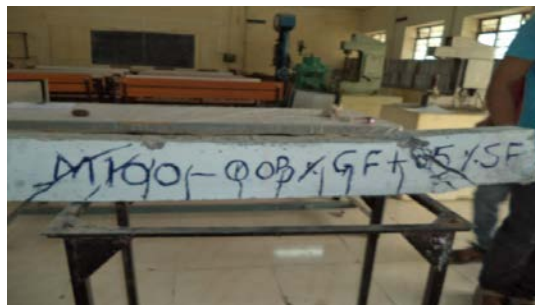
Failure modes of Hybrid fibre High Strength Reinforced Concrete Self Compacted Beams
